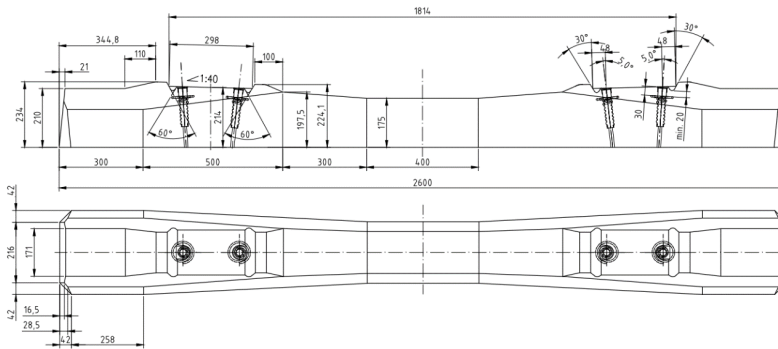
Shape and dimensions of the B70W-60 sleeper [16]
